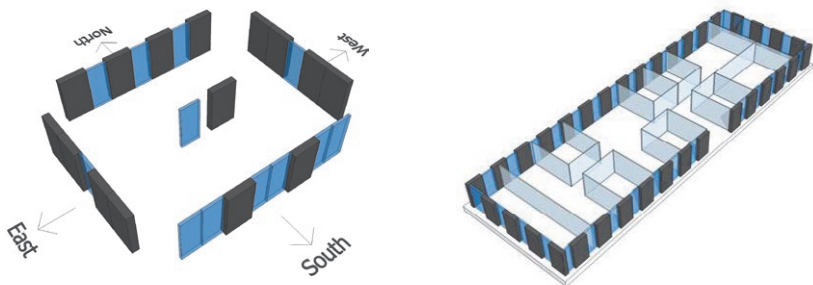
+16: Modular design both in the building design (plan) and the building elements (façade)
